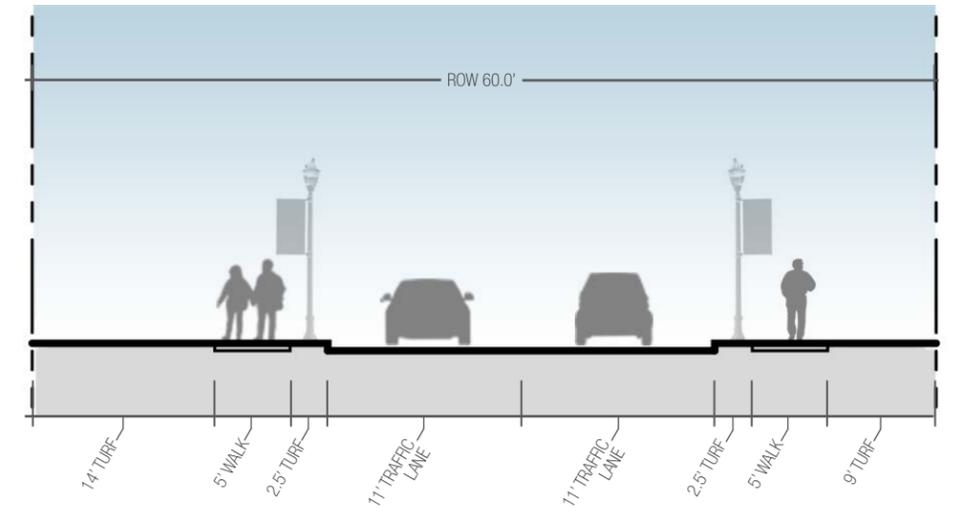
PROPOSED SLATER SECTION AND PLAN
